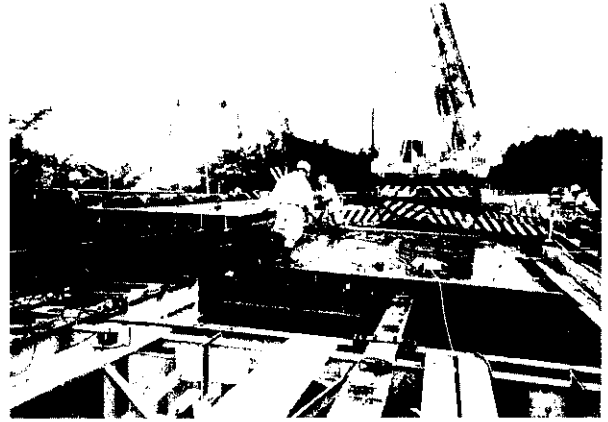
Renewing works of damaged bridge deck by steel deck
